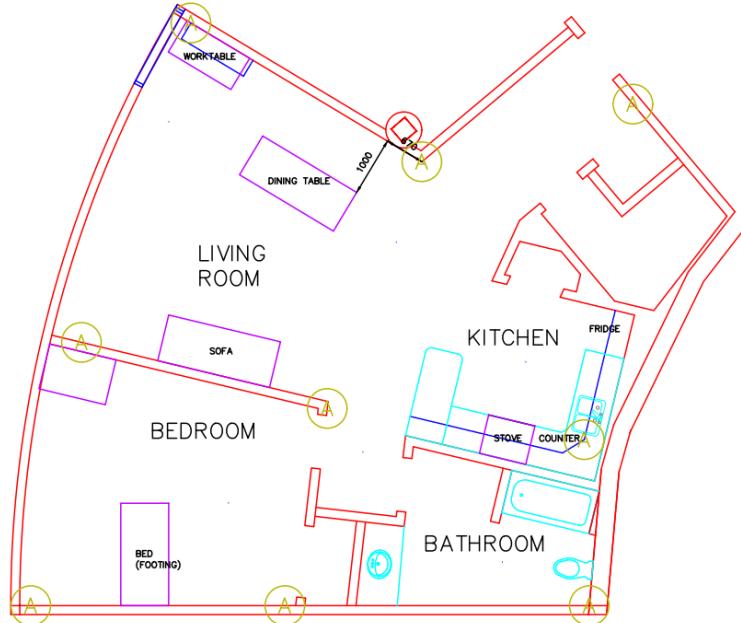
ILS Floorplan with the 9 anchors all high.
